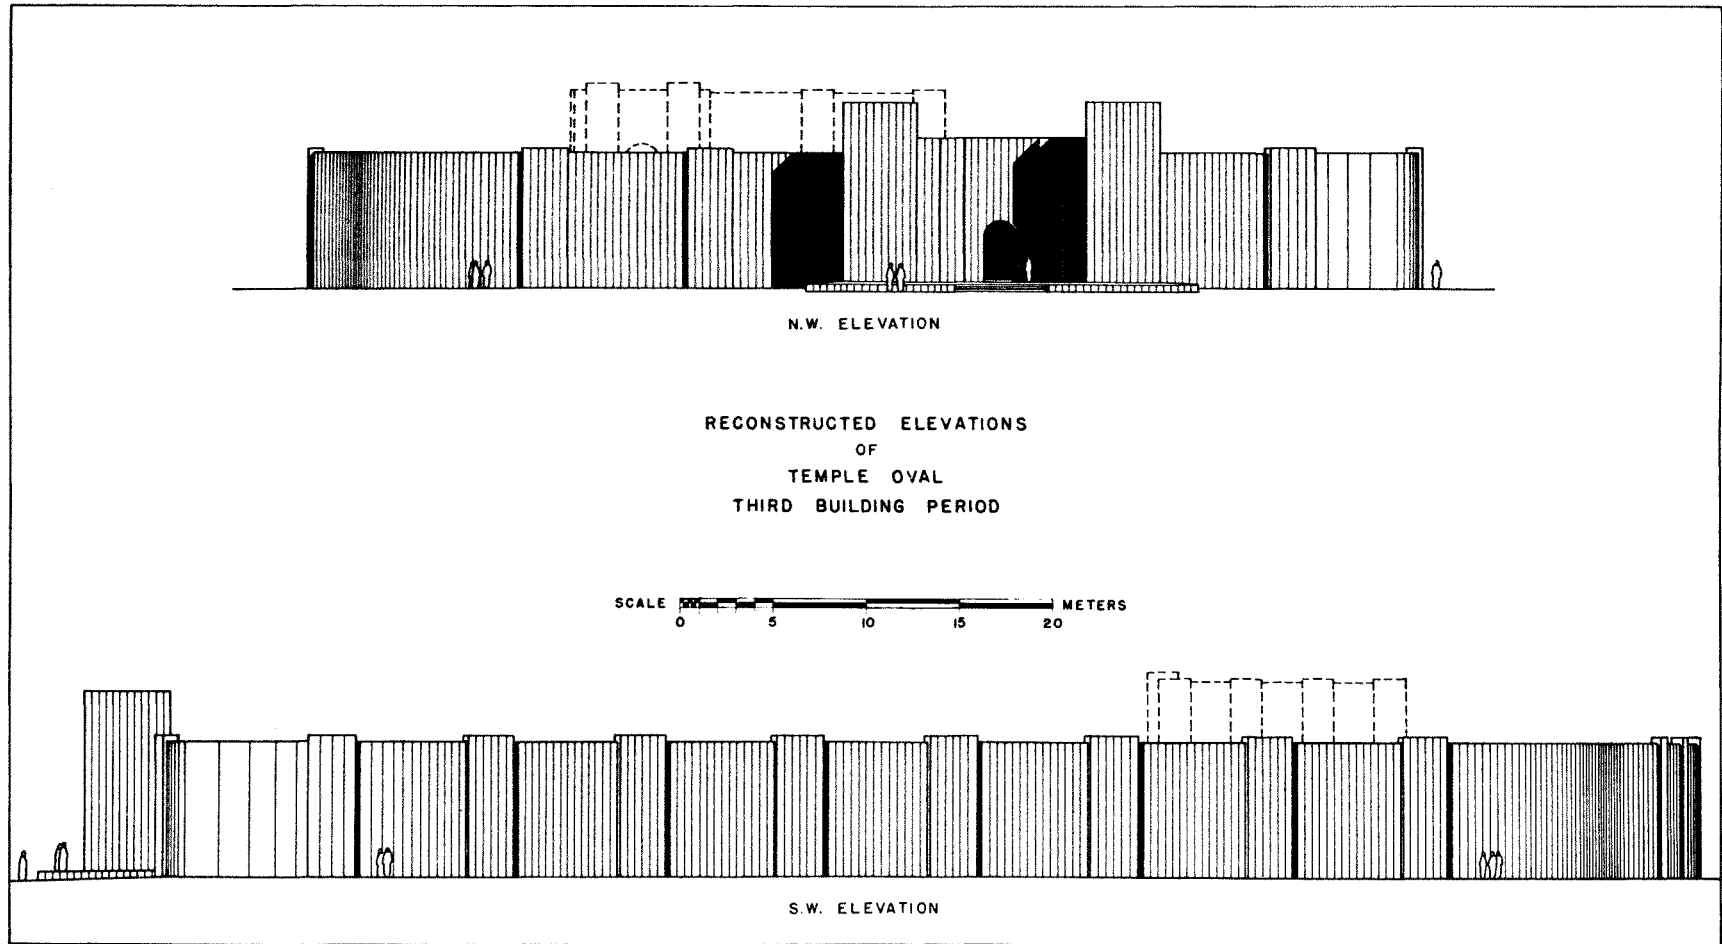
RECONSTRUCTED NORTHWEST AND SOUTHWEST ELEVATIONS OF THE TEMPLE OVAL OF THE THIRD BUILDING PERIOD, BASED ON THE PLAN IN FIGURE 103. SCALE, 1:400
